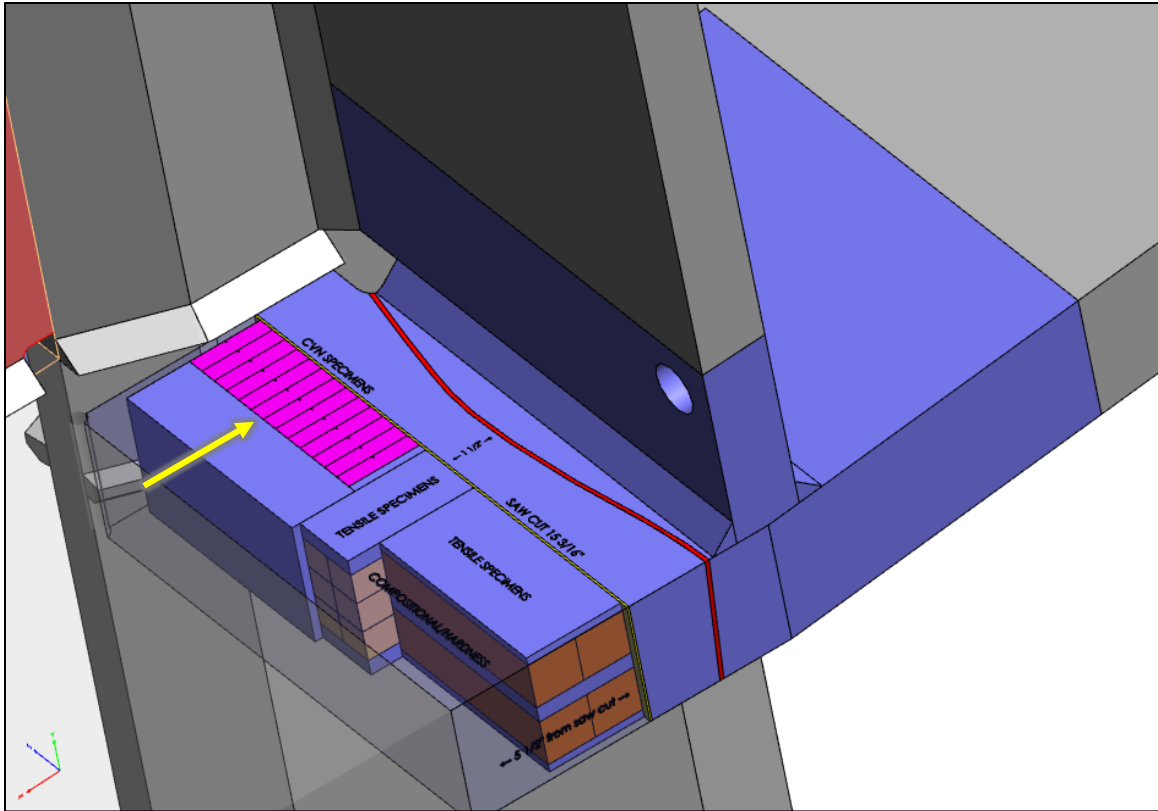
CVN specimen removal location from the Fremont Street girder samples.
